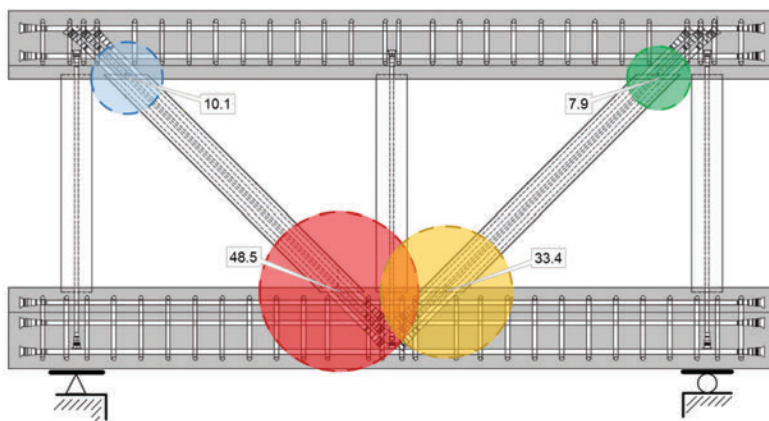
Location and severity of damage in the element connections of Girder 2
